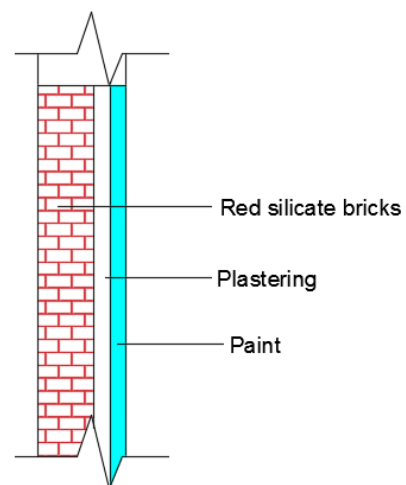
Red silicate brick wall section cut, Source: Authors
